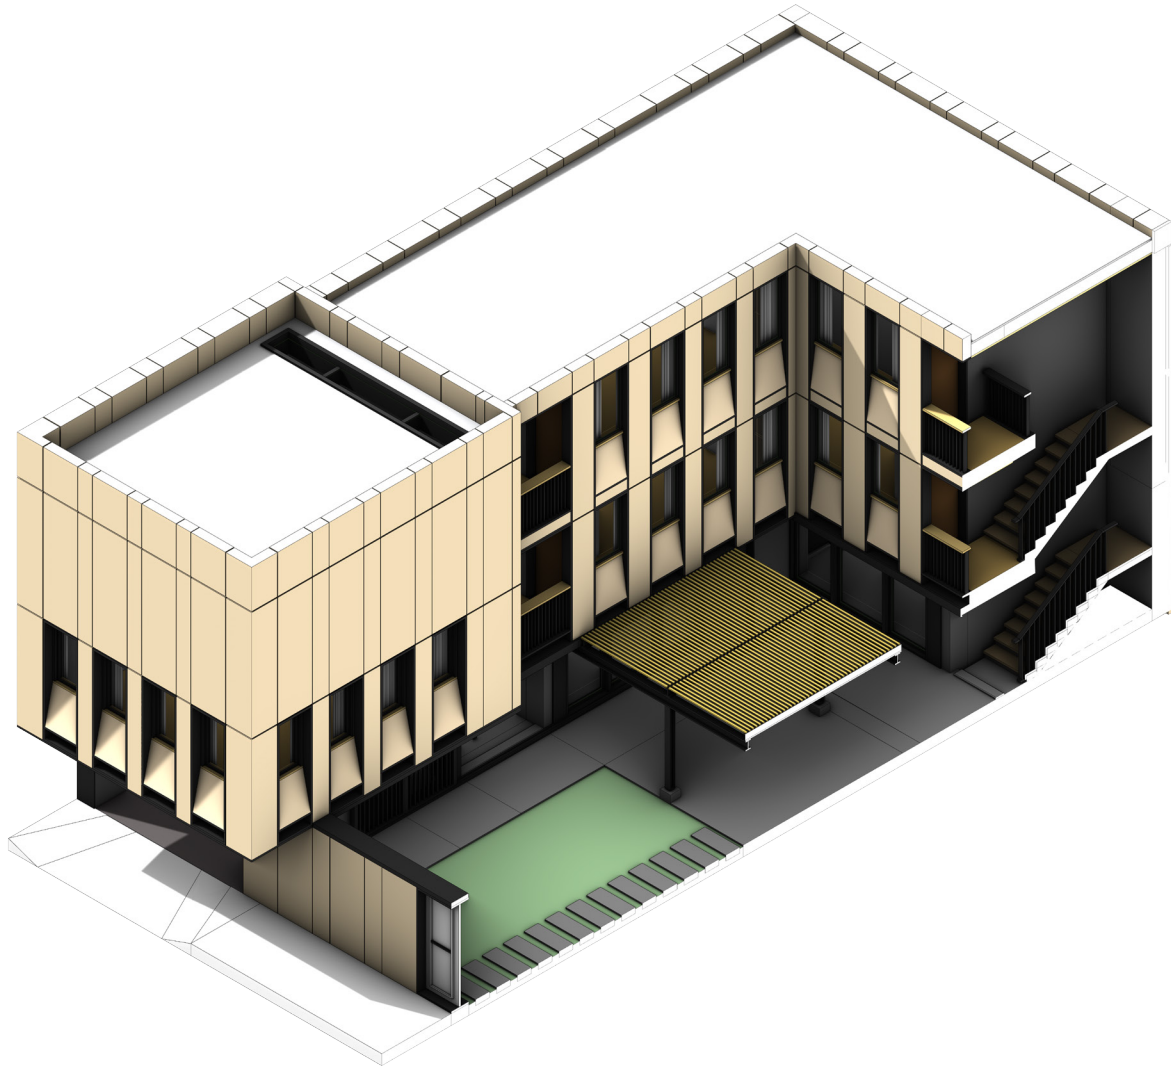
Cappadocia konak. Large residential structure with central courtyard. Rooms are connected with an external hallway. Axonometric section view.
